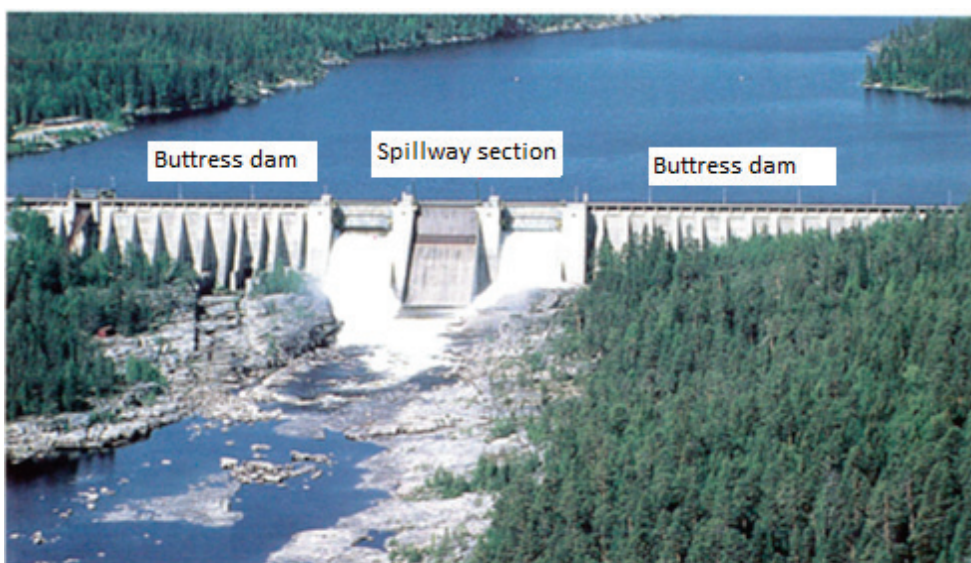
The spillway dam before a new climate wall was built in 2012
